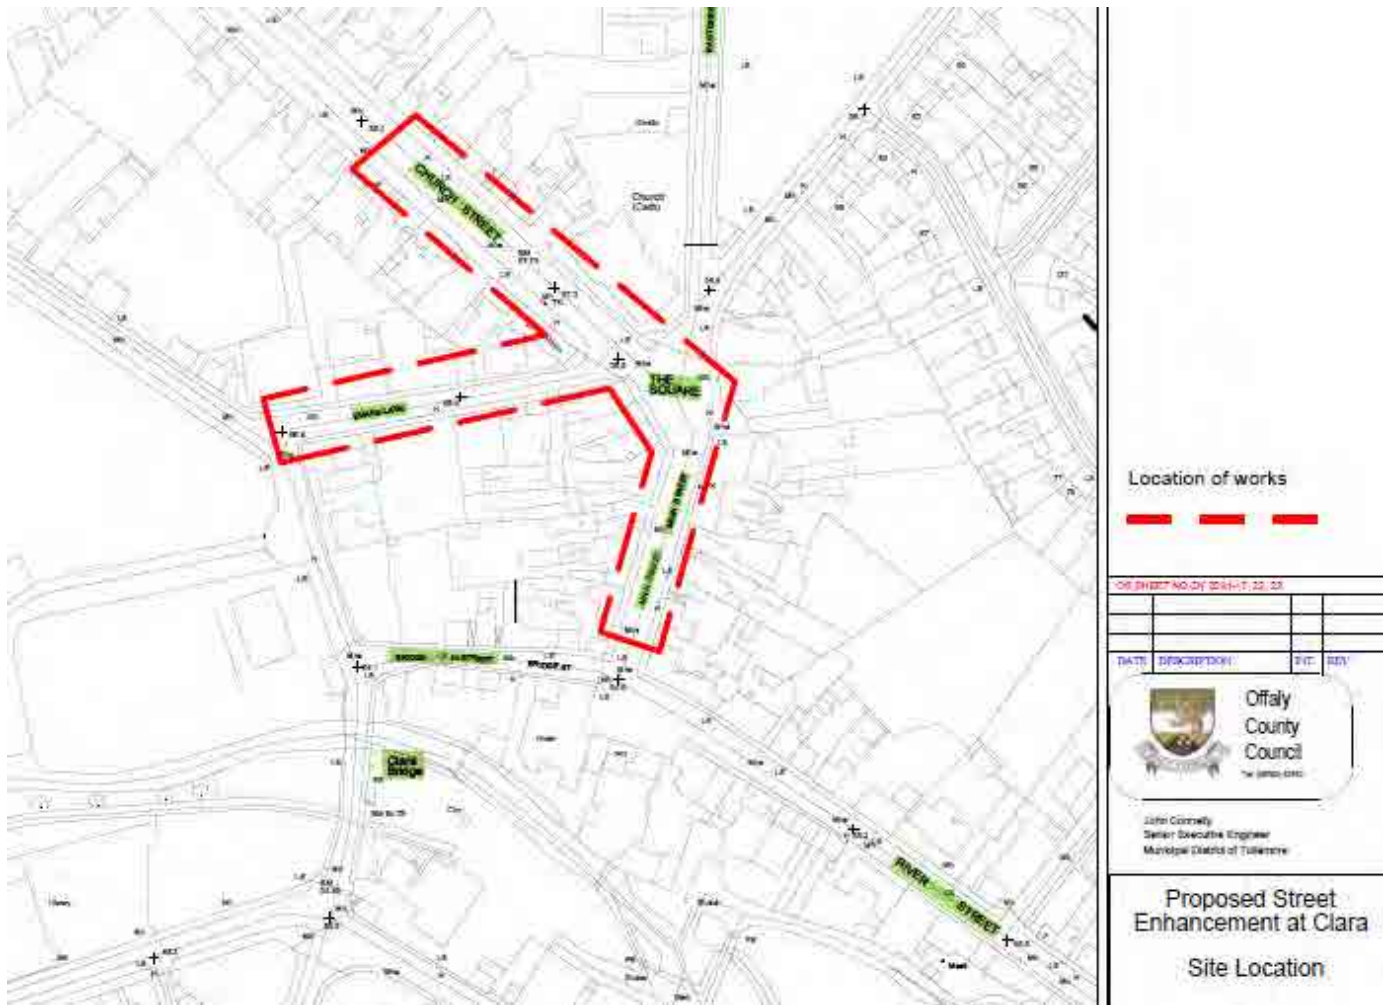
Proposed Site Layout (Part 8 Scheme)
